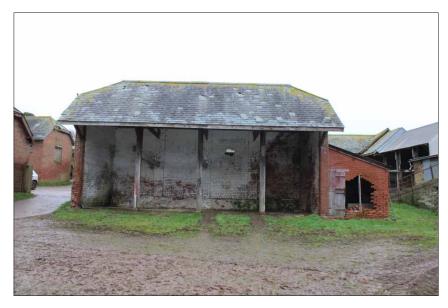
East elevation of cart linhay and brick shed, looking west (1m scale)
